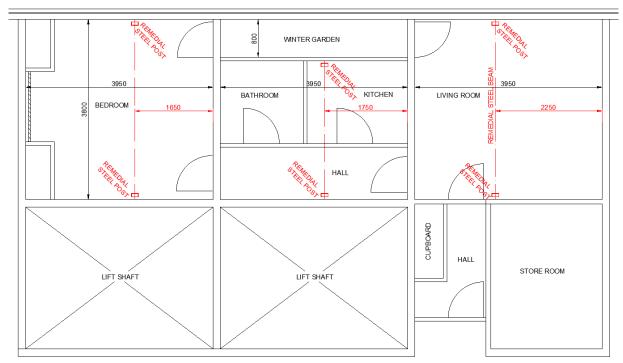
Flat 65 floor plan showing location of strengthening beams and columns
